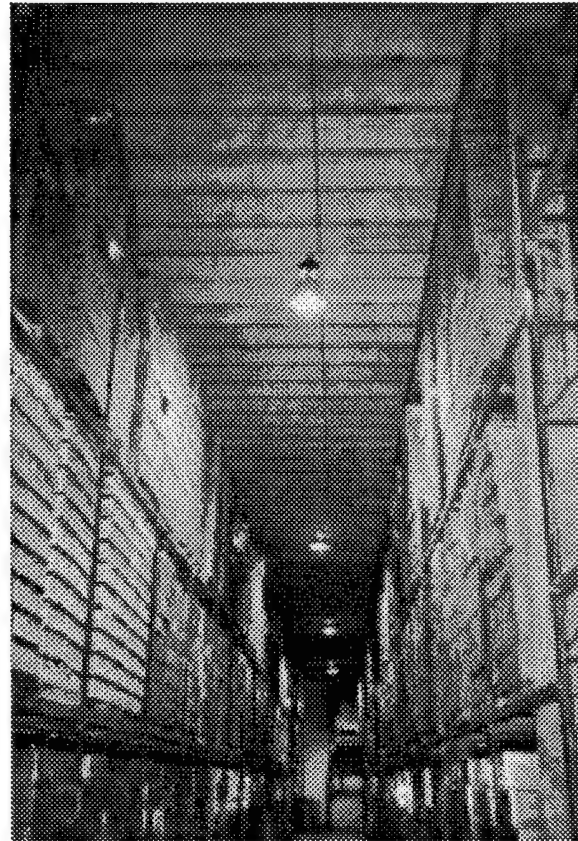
Interior view of the freezer below roof D1, which has a precast concrete deck.
